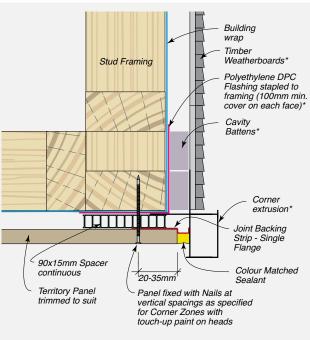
Typical External Corner Junction Panel to Weatherboard - Plan View
